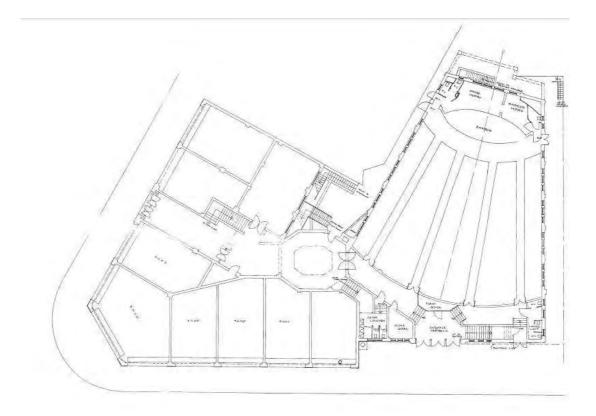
Ground Floor Plan of Archway Central Hall, 1934. Source: Archway Methodist Church.
